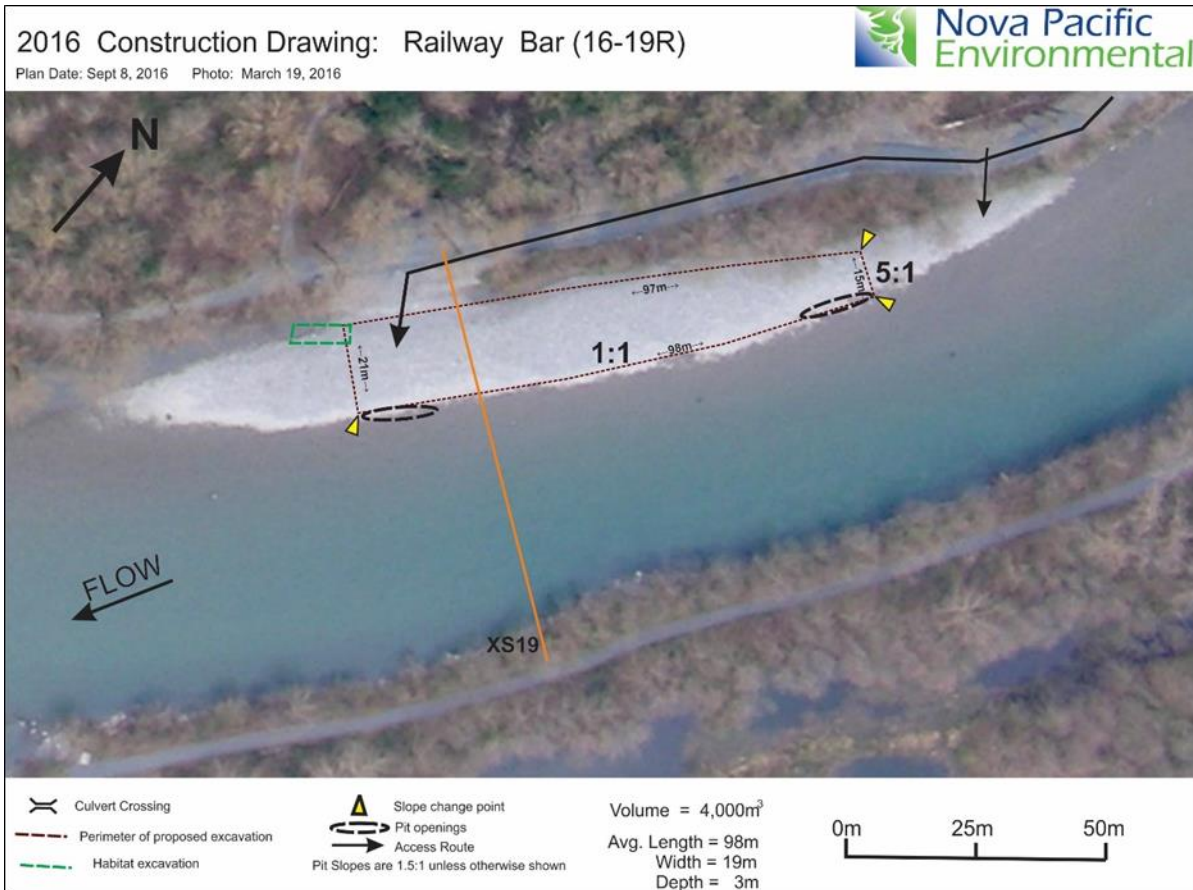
Aerial view of the Railway Bar excavation plan. Photo taken March 19, 2016, drawing – September 8, 2016.
